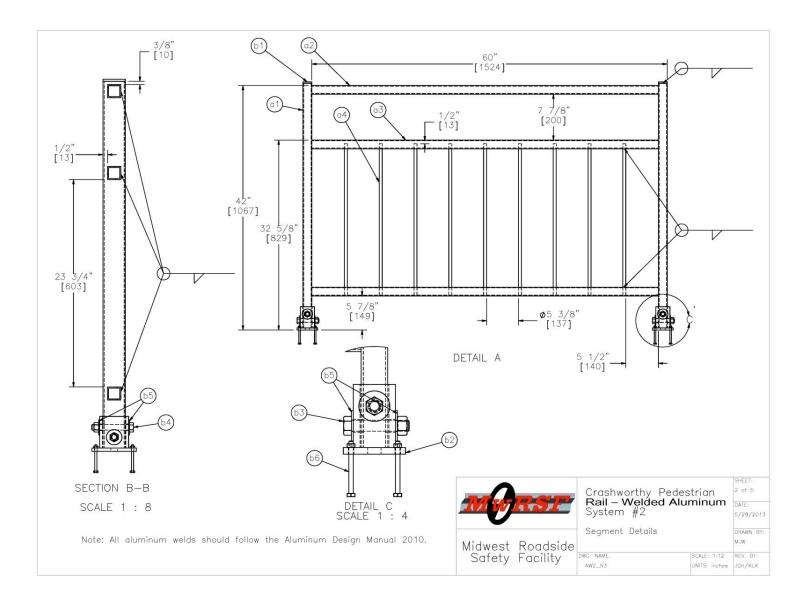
Welded Aluminum Rail, Design Concept AW2 (Sheet 2 of 5)
